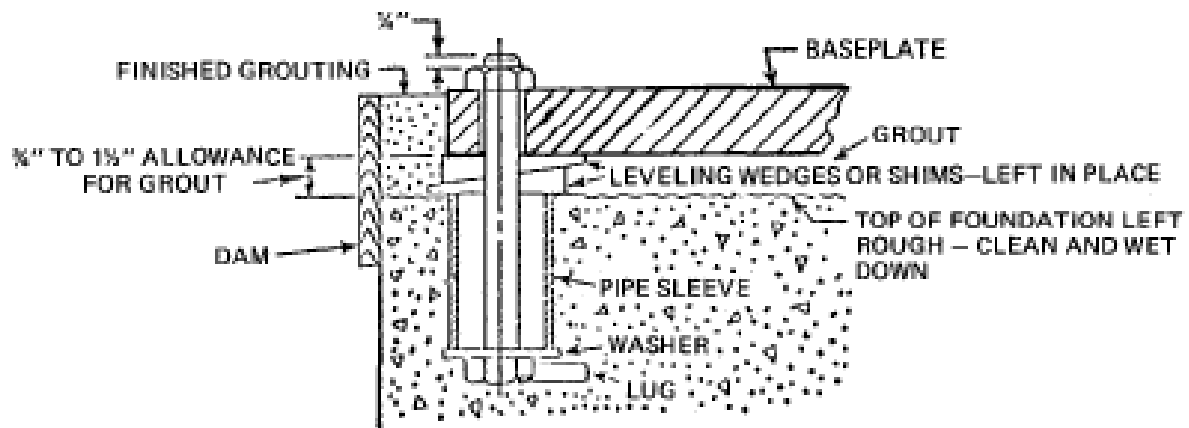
TYPICAL FOUNDATION BOLT DESIGN
